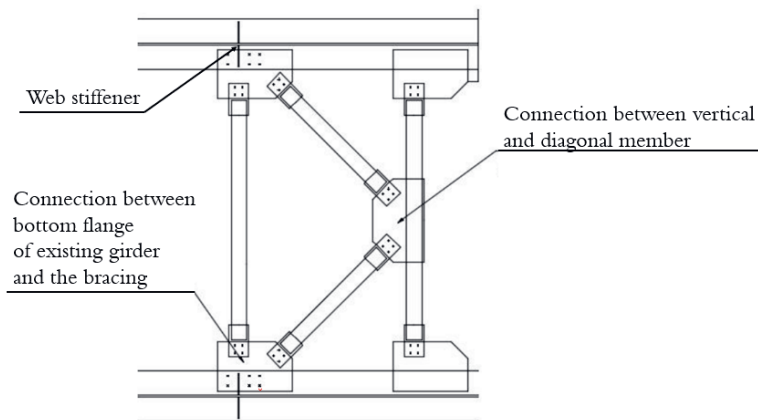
Suggestion for connecting a K-shape bracing between the bottom flanges.
